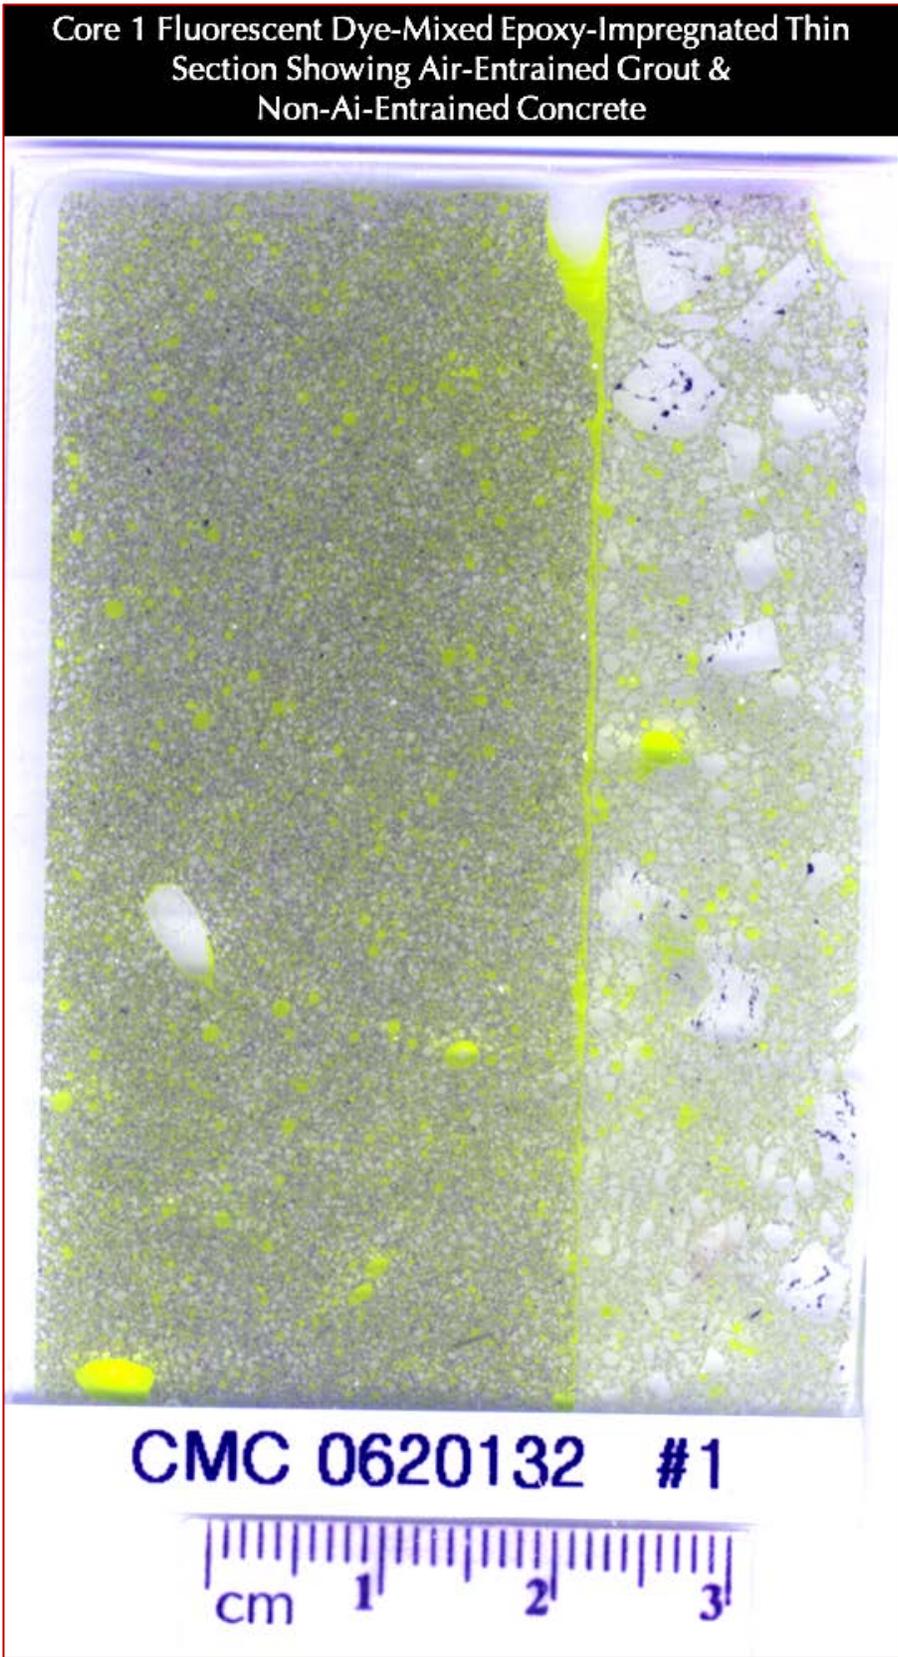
Fluorescent dye-mixed epoxy-impregnated thin section of grout and concrete in Core 1 showing:
